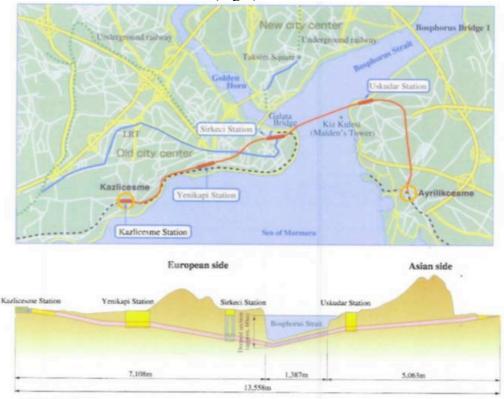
The Marmaray Rail Tube Tunnel Plan and Section (Heidenhain, 2010: 1)
